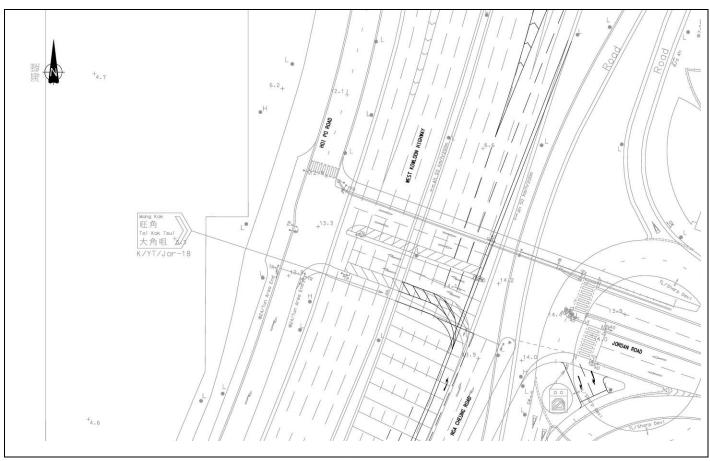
Existing Junction Layout of Jordan Road/Hoi Po Road (J7)
